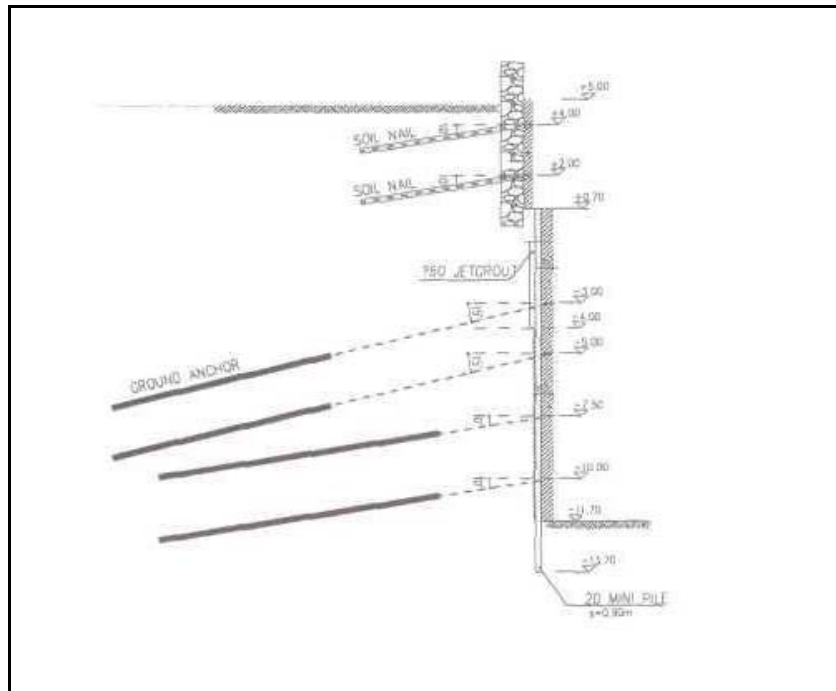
An application of soil nailing as a reinforcement of an old wall in Istanbul (Saglamer *et al.*, 2007)
